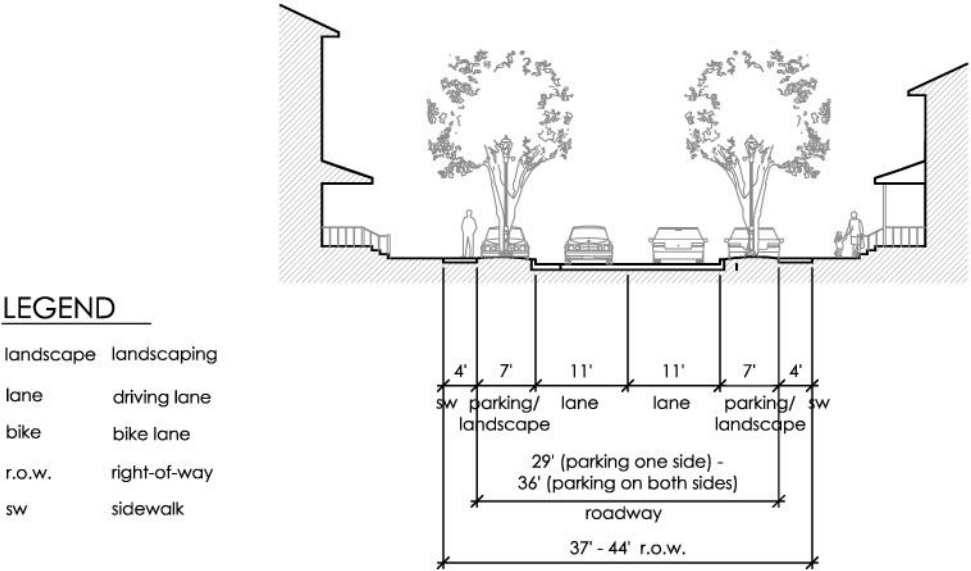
Typical Local Street (Parking on One or Both Sides)
